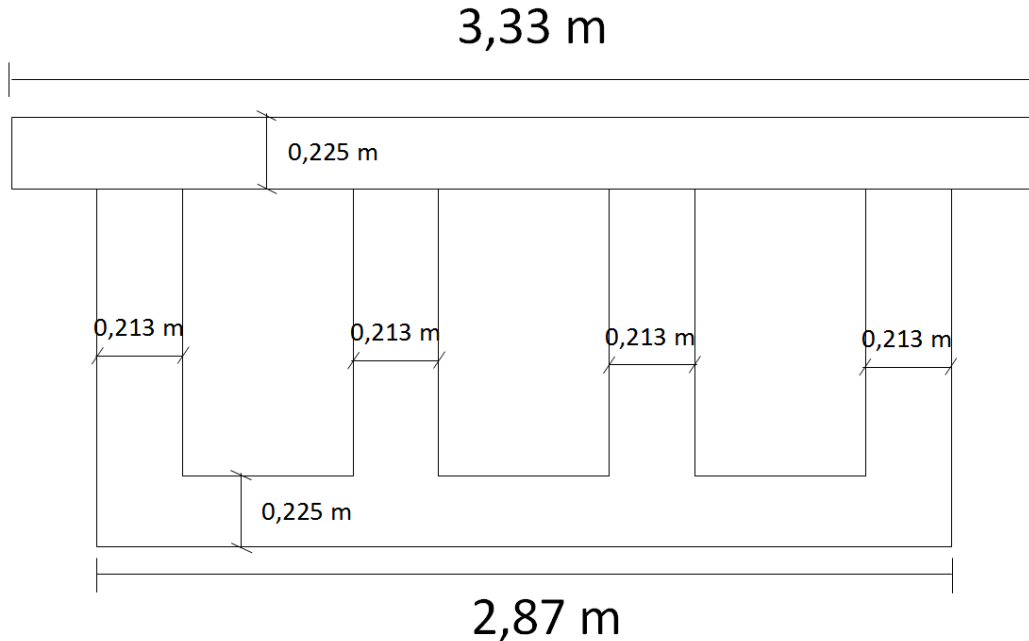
Cross section and dimensions of the box-beam made of glulam.
